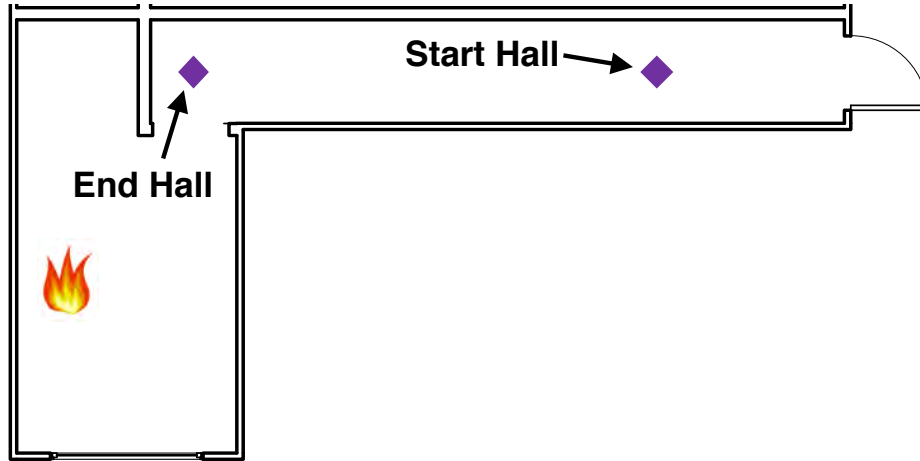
Floor plan showing the “end hall” and “start hall” measurement locations. The end hall pair was centered in the fire room doorway and between the hallway walls. Likewise, the start hall pair was centered in the hallway and located approximately 8.0 ft (2.4 m) from the hallway door.
